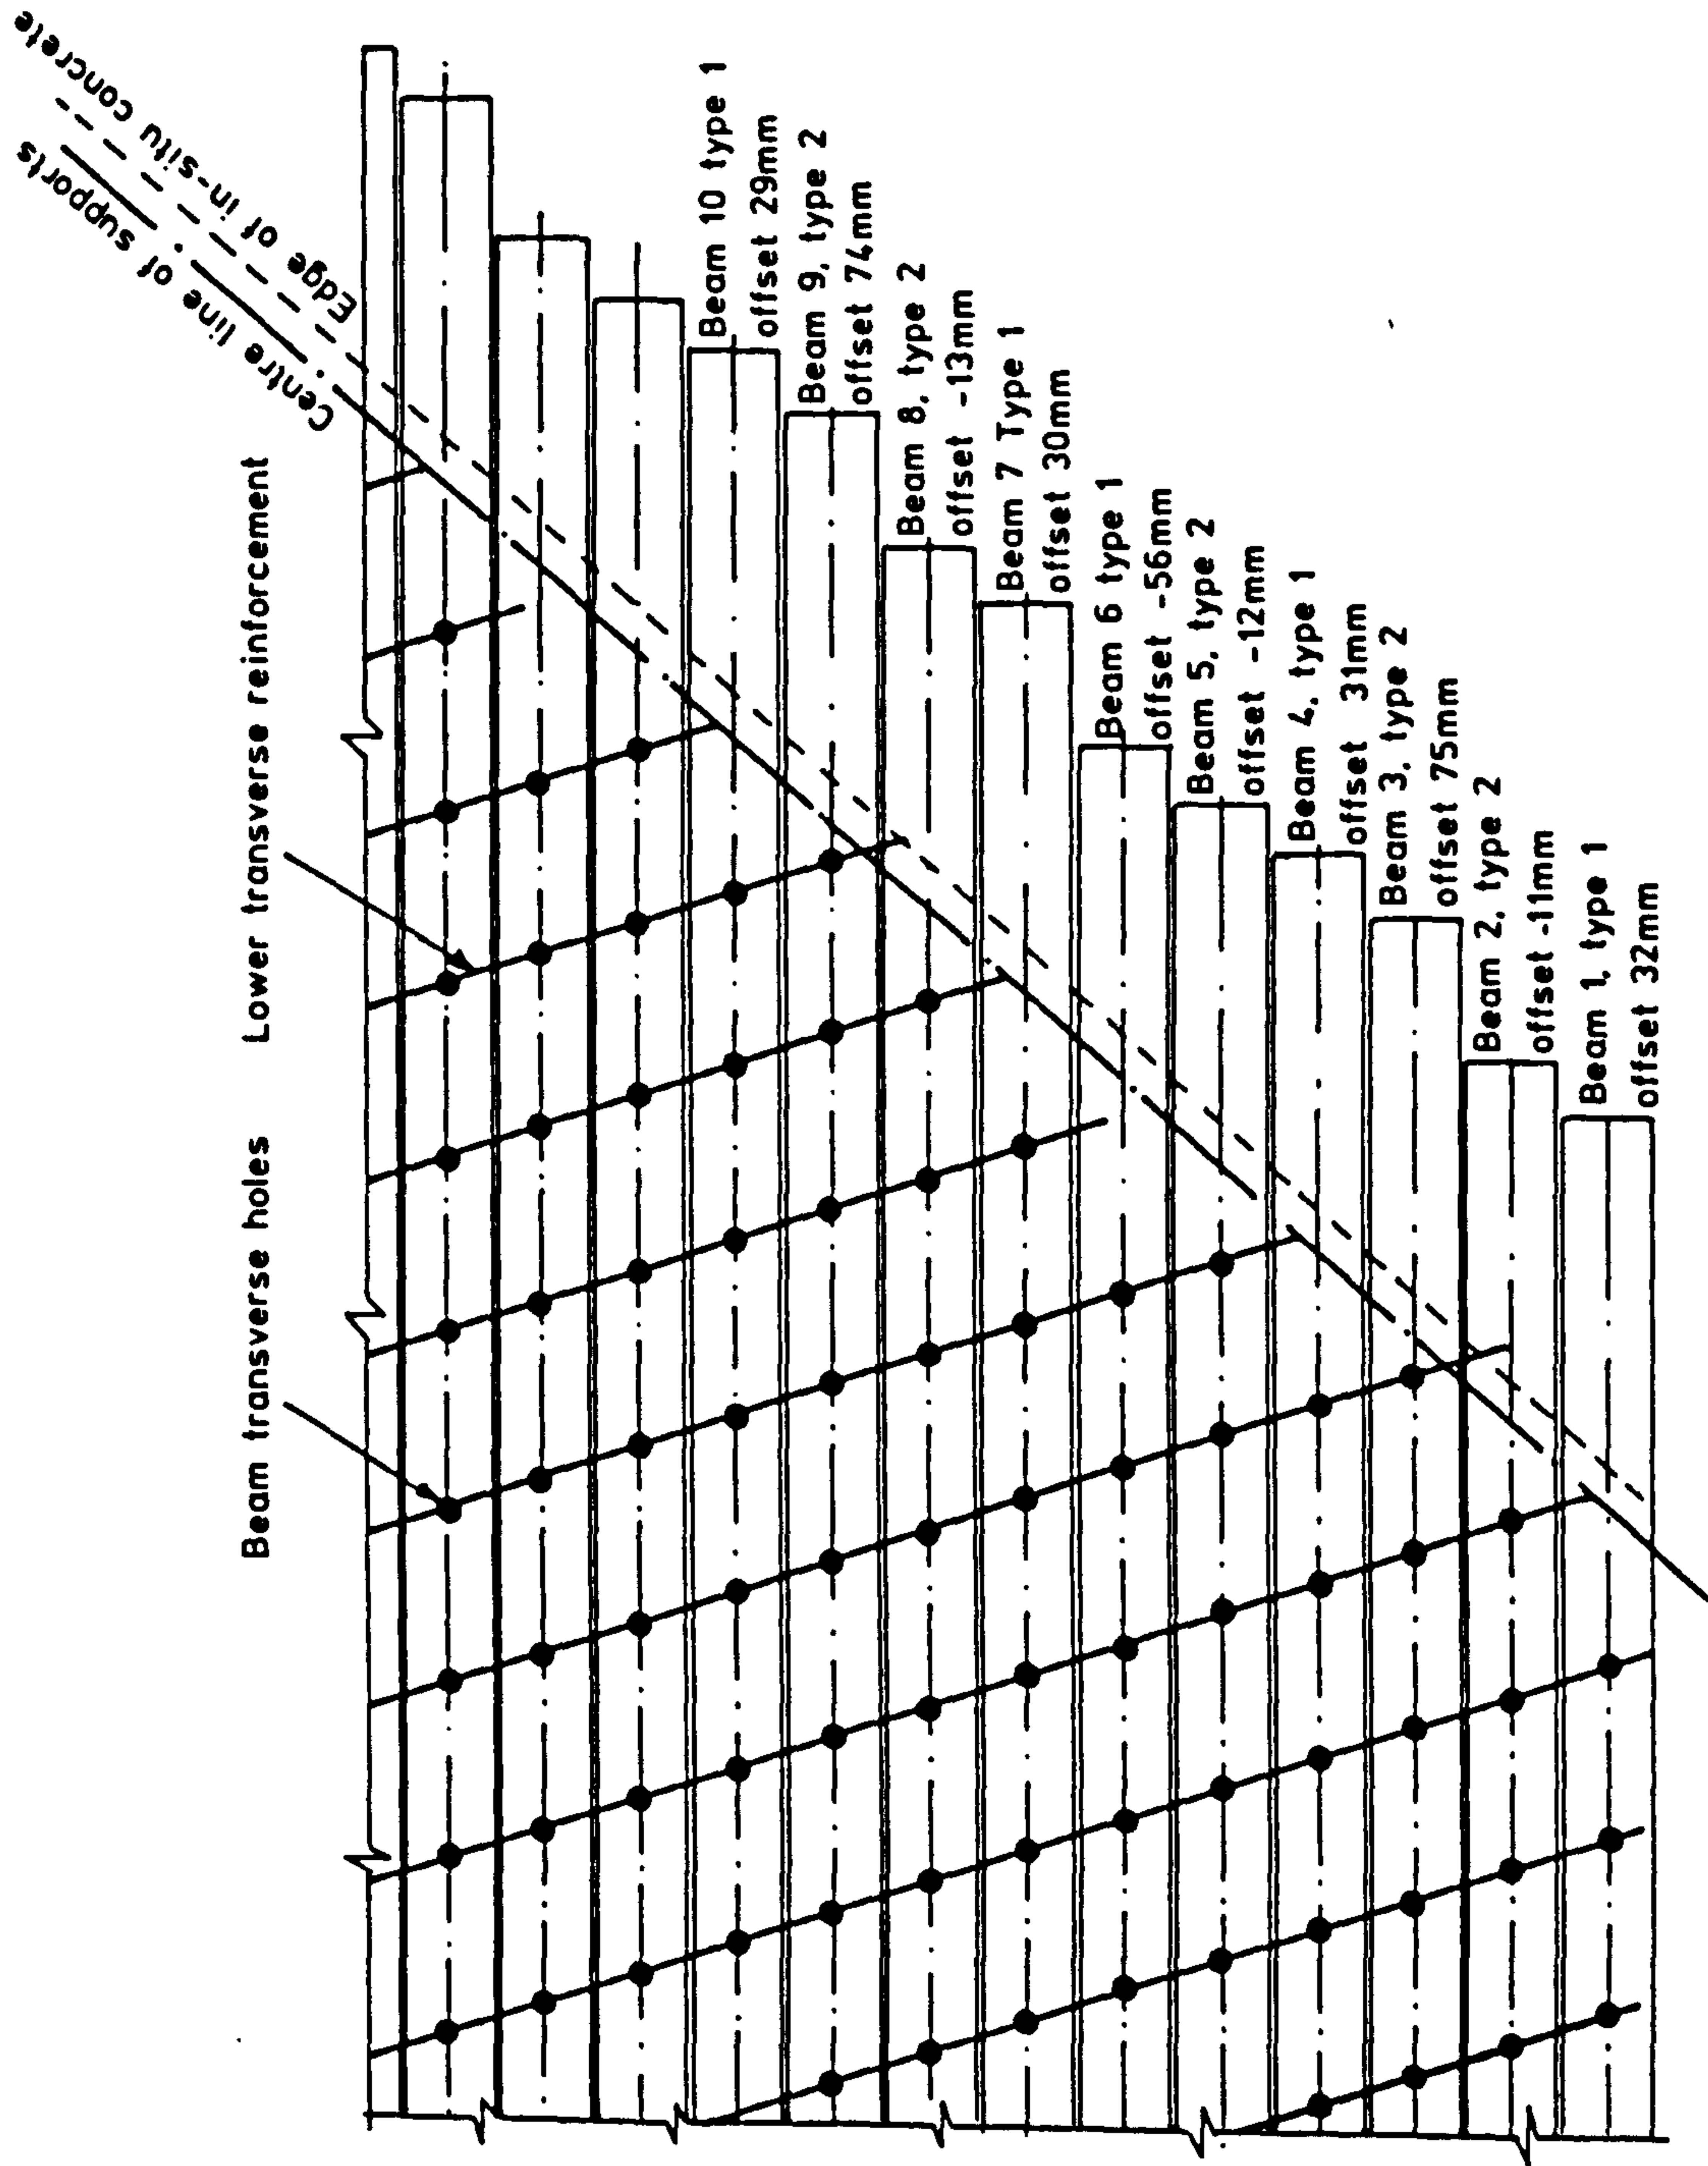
OFFSET PRECAST BEAM DETAIL FOR MODEL DECK 2
